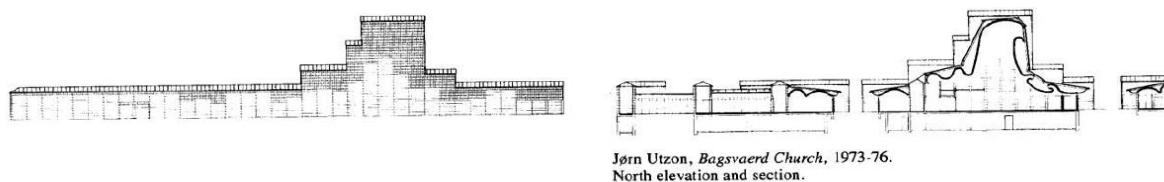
North Elevation and Building Section of the Bagsværd Church by Jørn Utzon, Copenhagen, 1976
